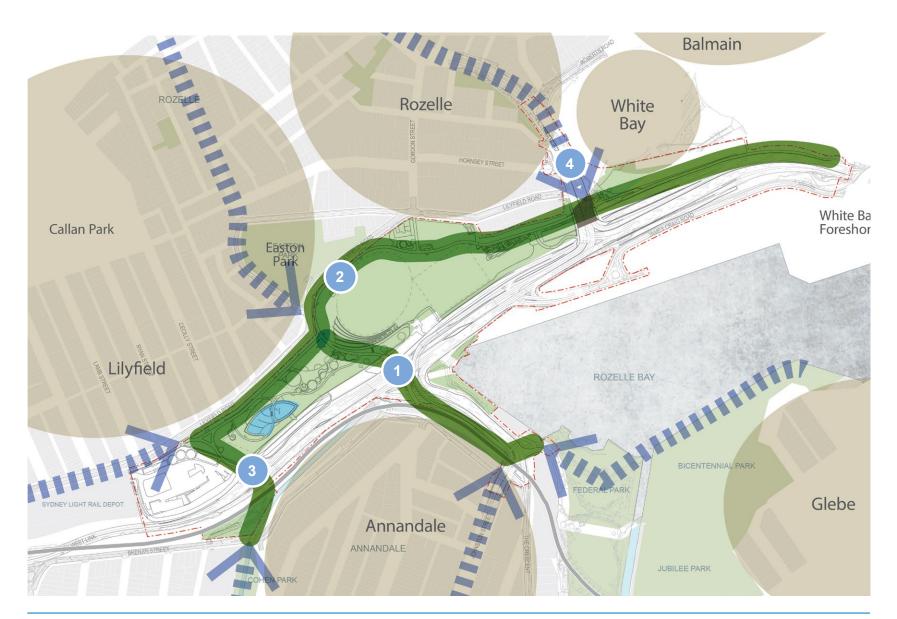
Plan - Active transport connections with connecting bridges. *Refer to Figure 4-12 for revised layout.
